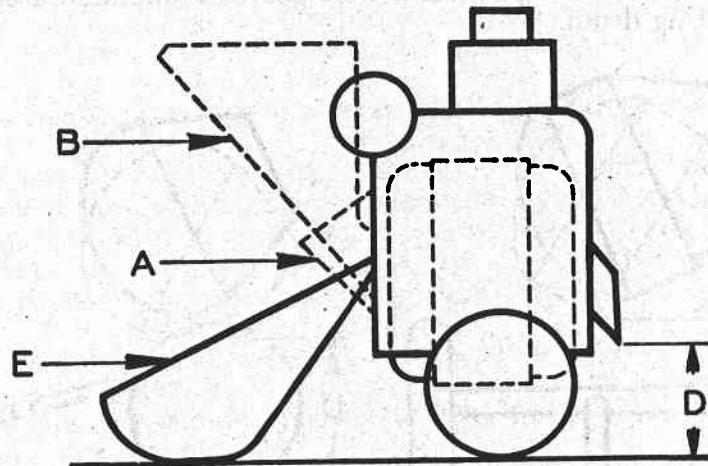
Construction mixer, nontilting type, two-opening drum, end hargeiscd (available in either two- or four-wheel mounting).
